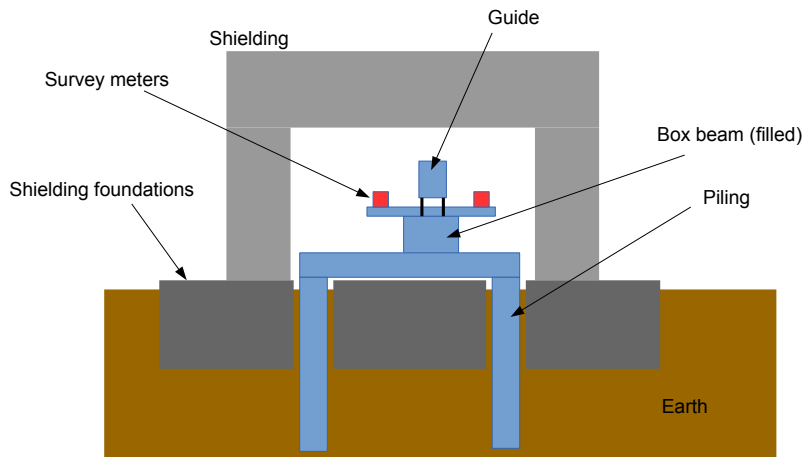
Concept for piling support of neutron guides, shown in cross-section looking down the axis of a neutron beam. The piles are arranged in pairs, 50 cm to 100 cm in separation, and a bridge is constructed between the piles.
